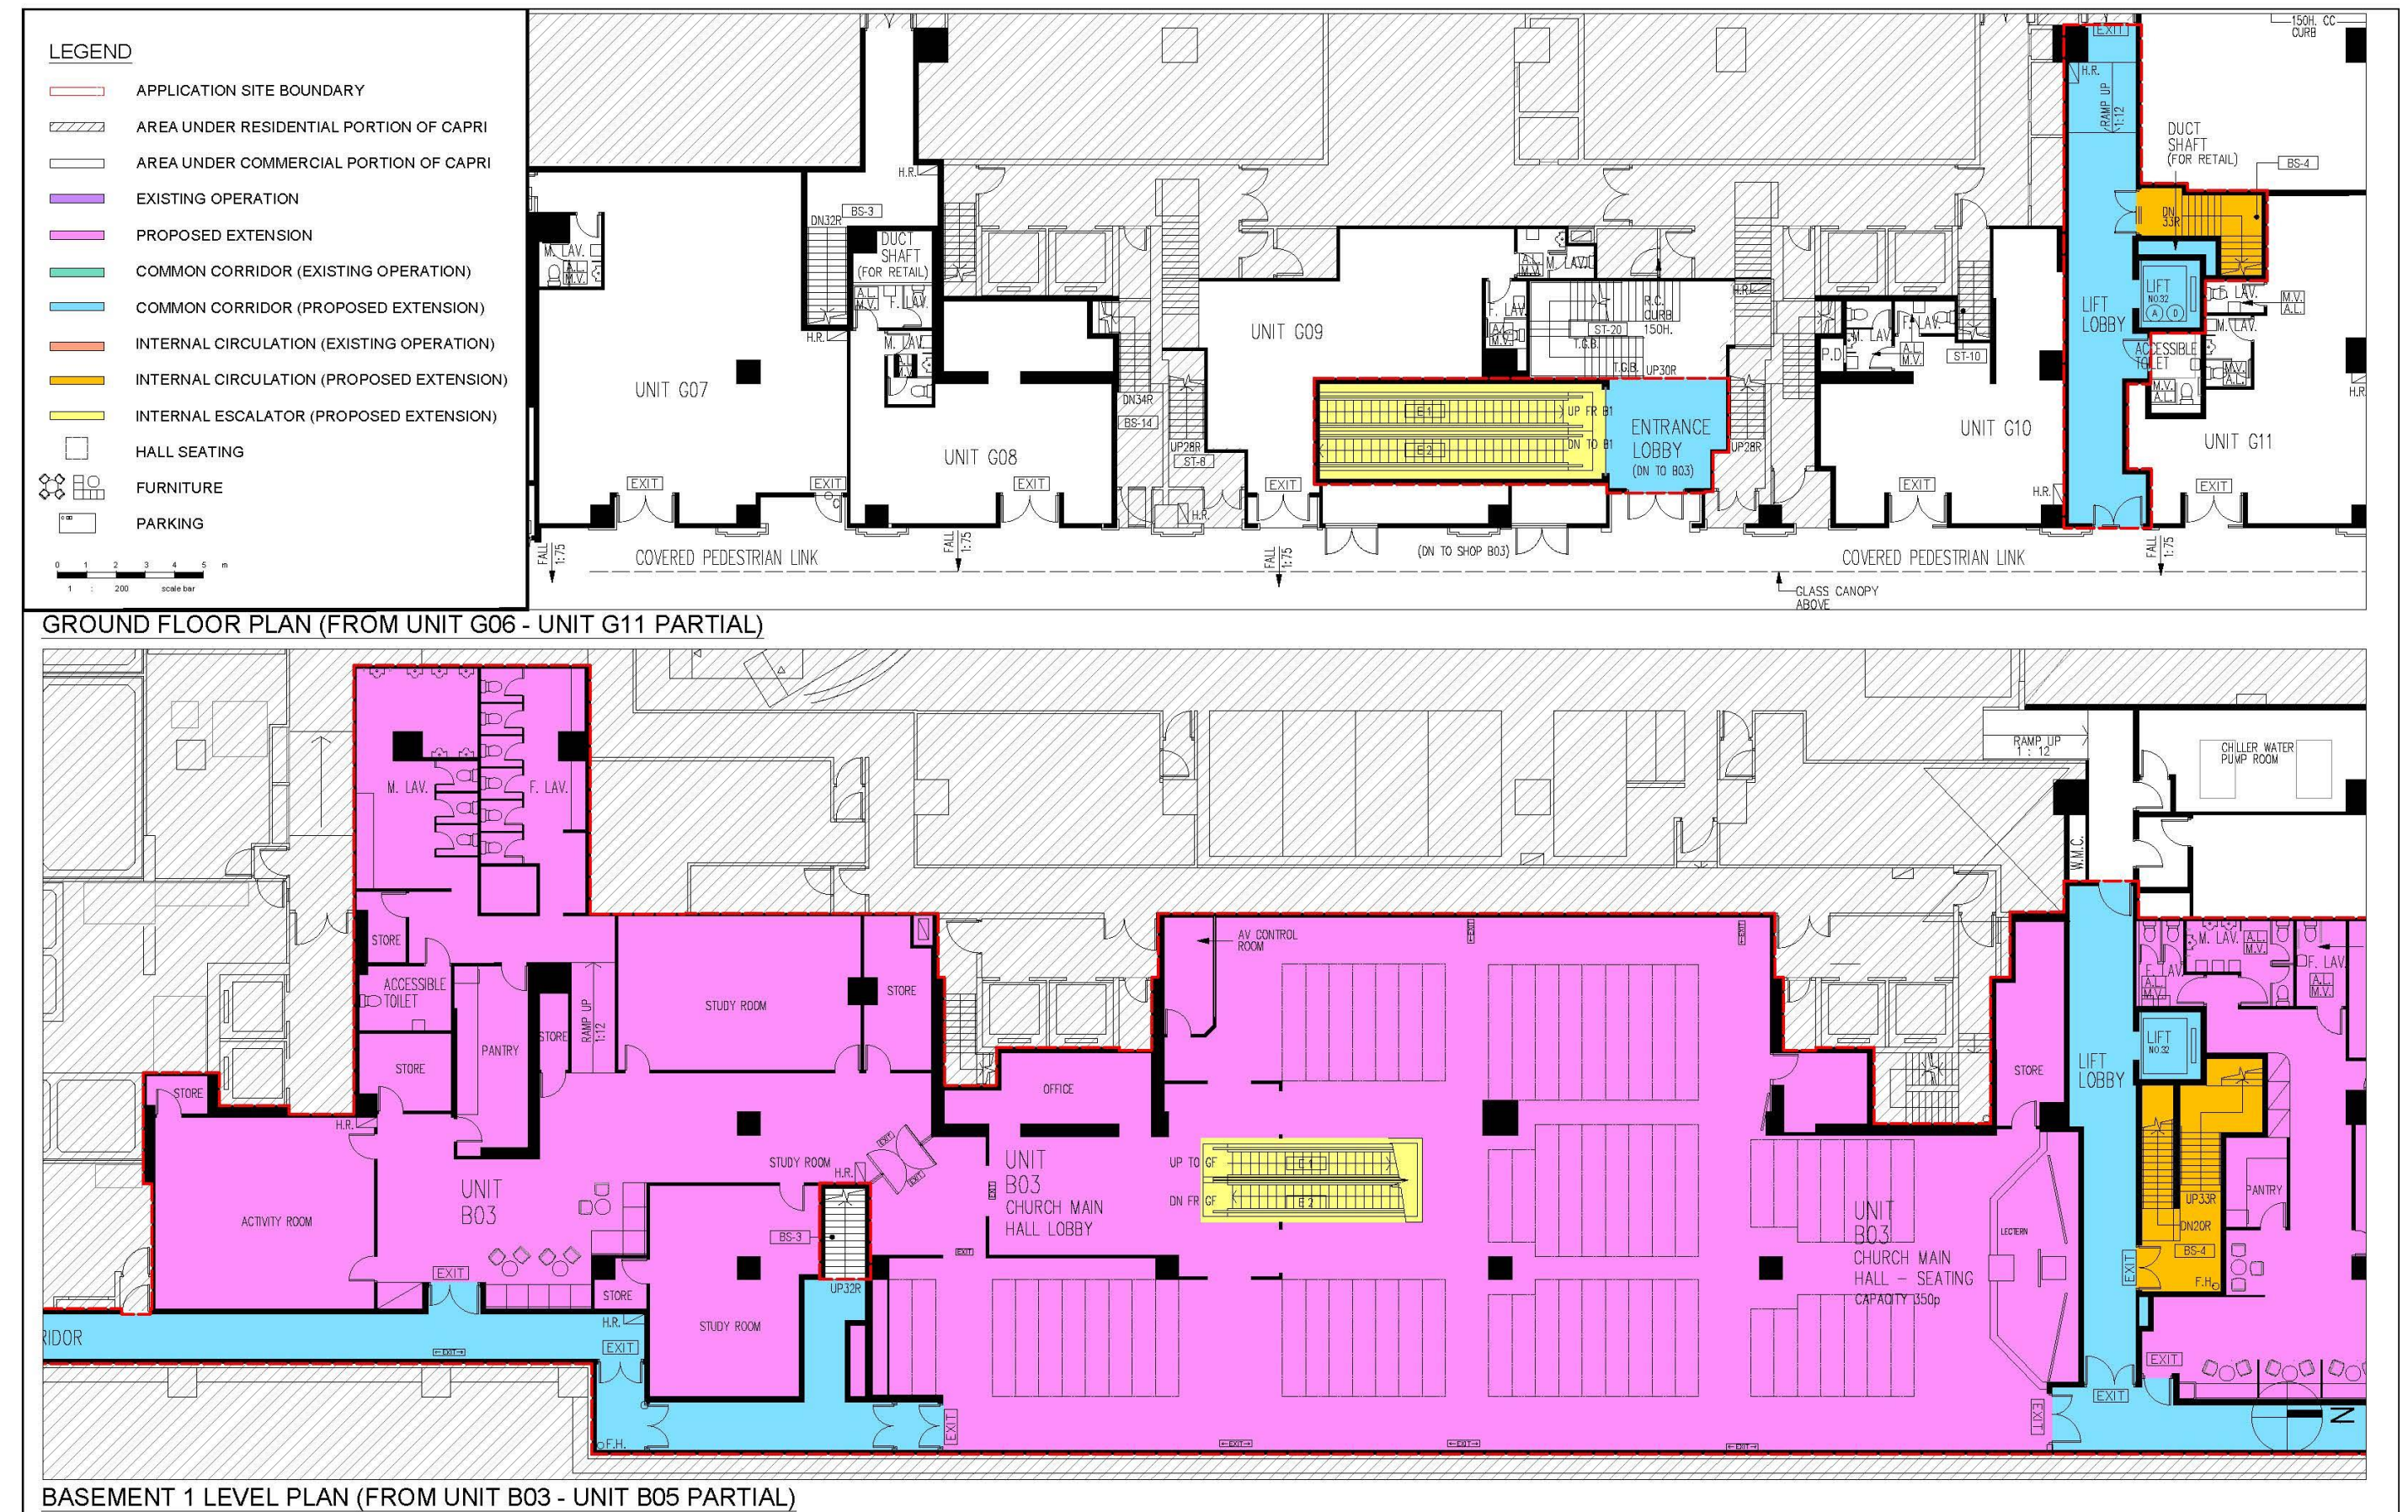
Proposed Uses at Central Portion of Ground Floor and Basement Level 1
